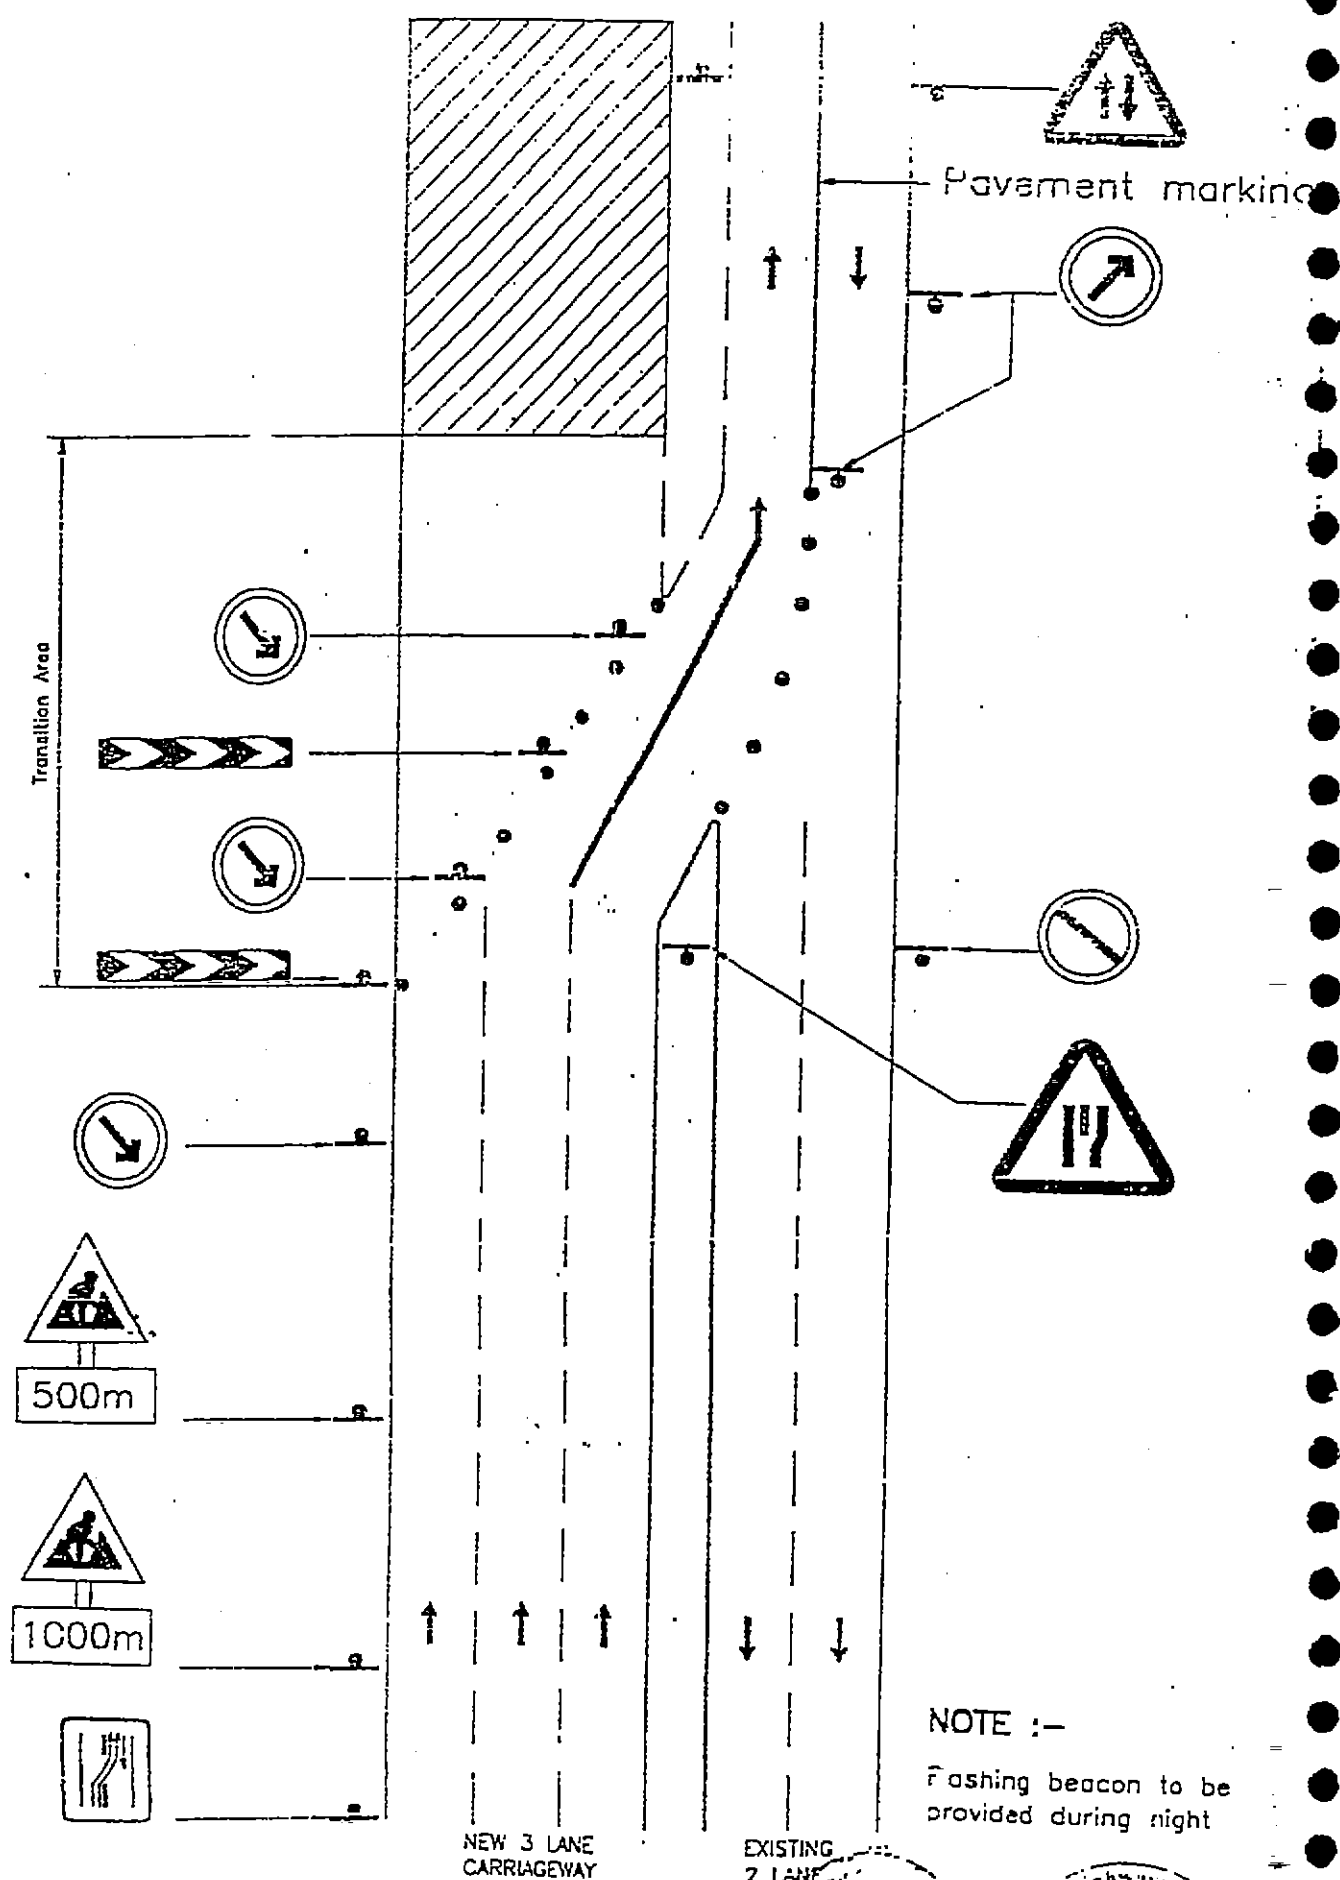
TYPICAL CONSTRUCTION AND CROSSOVER DETAIL
